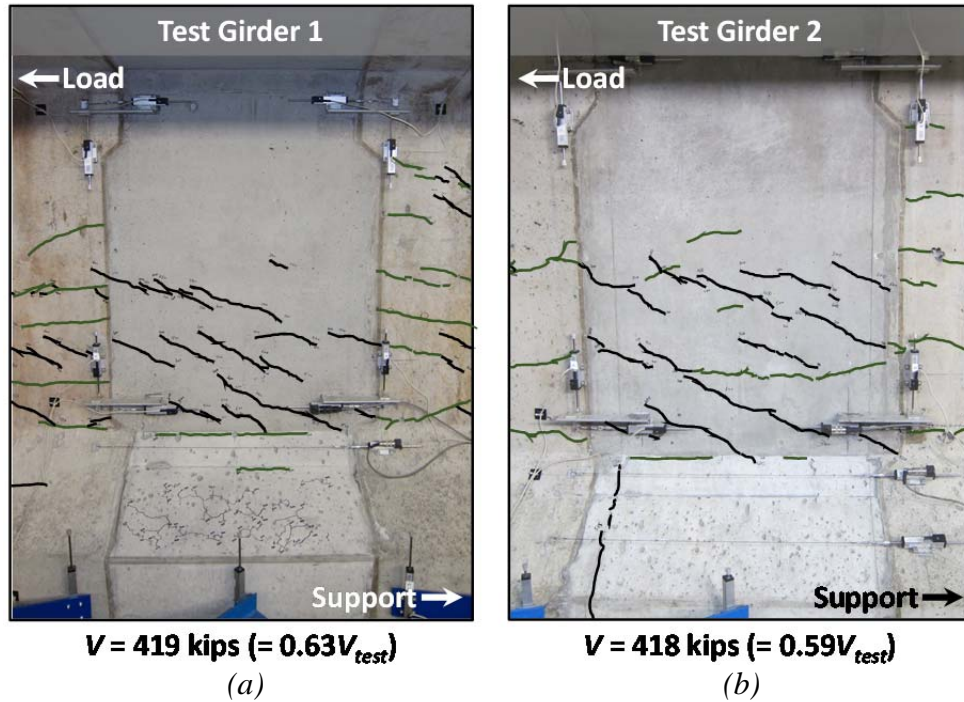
Distribution of cracks within the splice region – (a) Test Girder 1; (b) Test Girder 2
